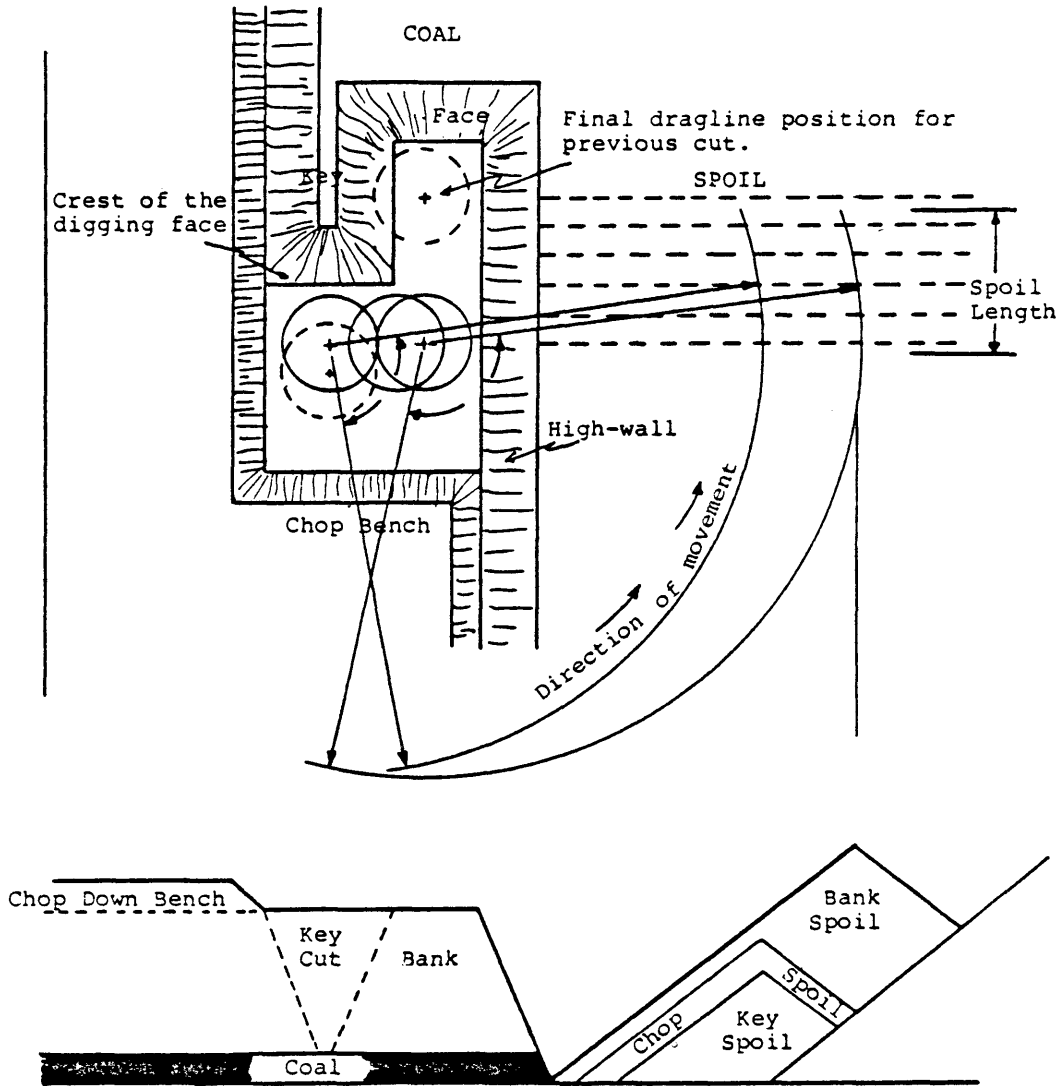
Plan and Cross Sectional View of Dragline Positions for Back Chopping to Prepare a Working Pad.
